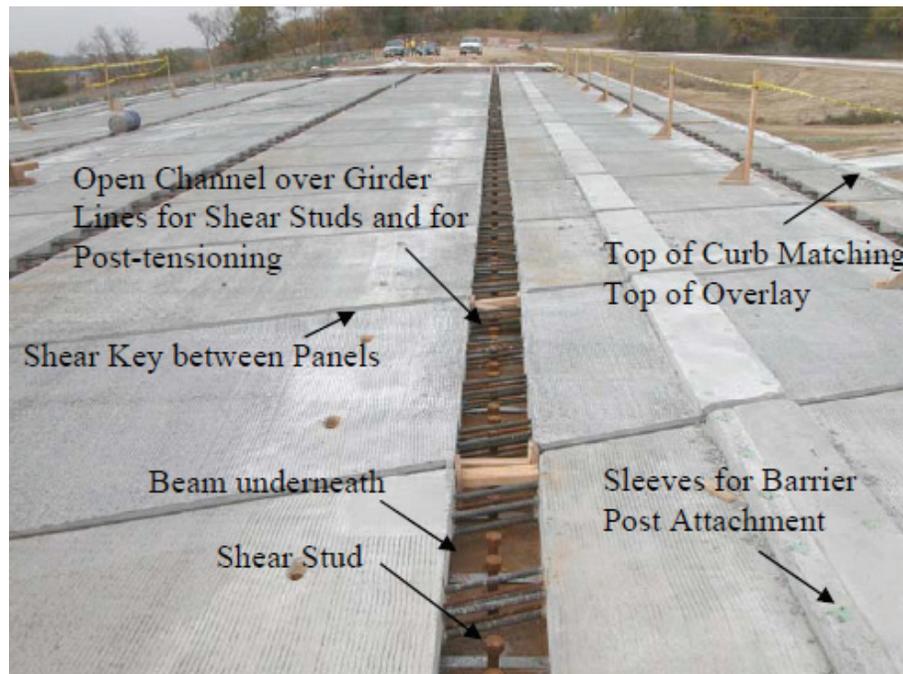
Installed panels before post-tensioning in the open channels.
